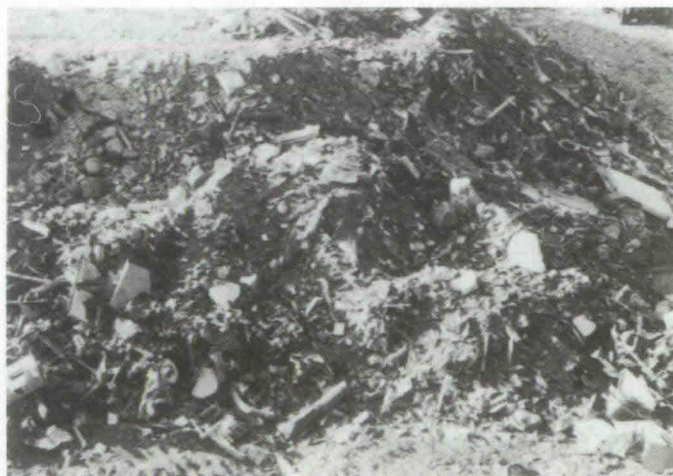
Concrete waste (classified roughly but still containing wood, etc.)
